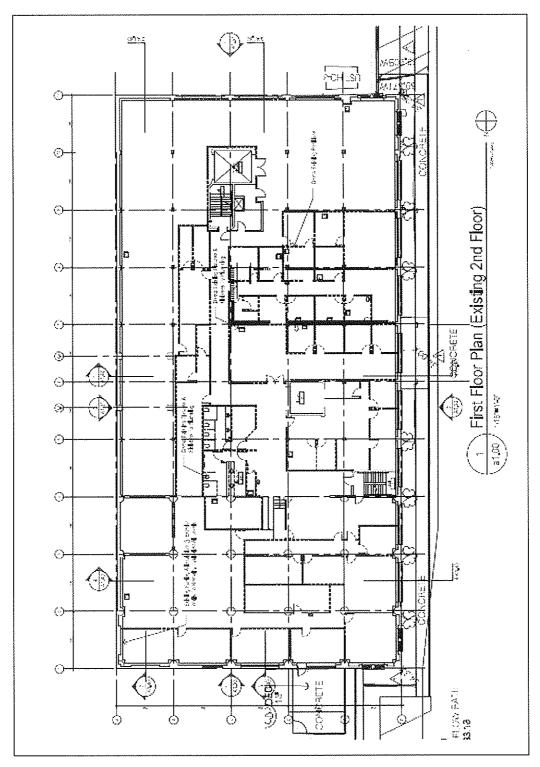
Floor Plans, As Built, Basement (1st Floor) through Floor 4 (5th Floor)
